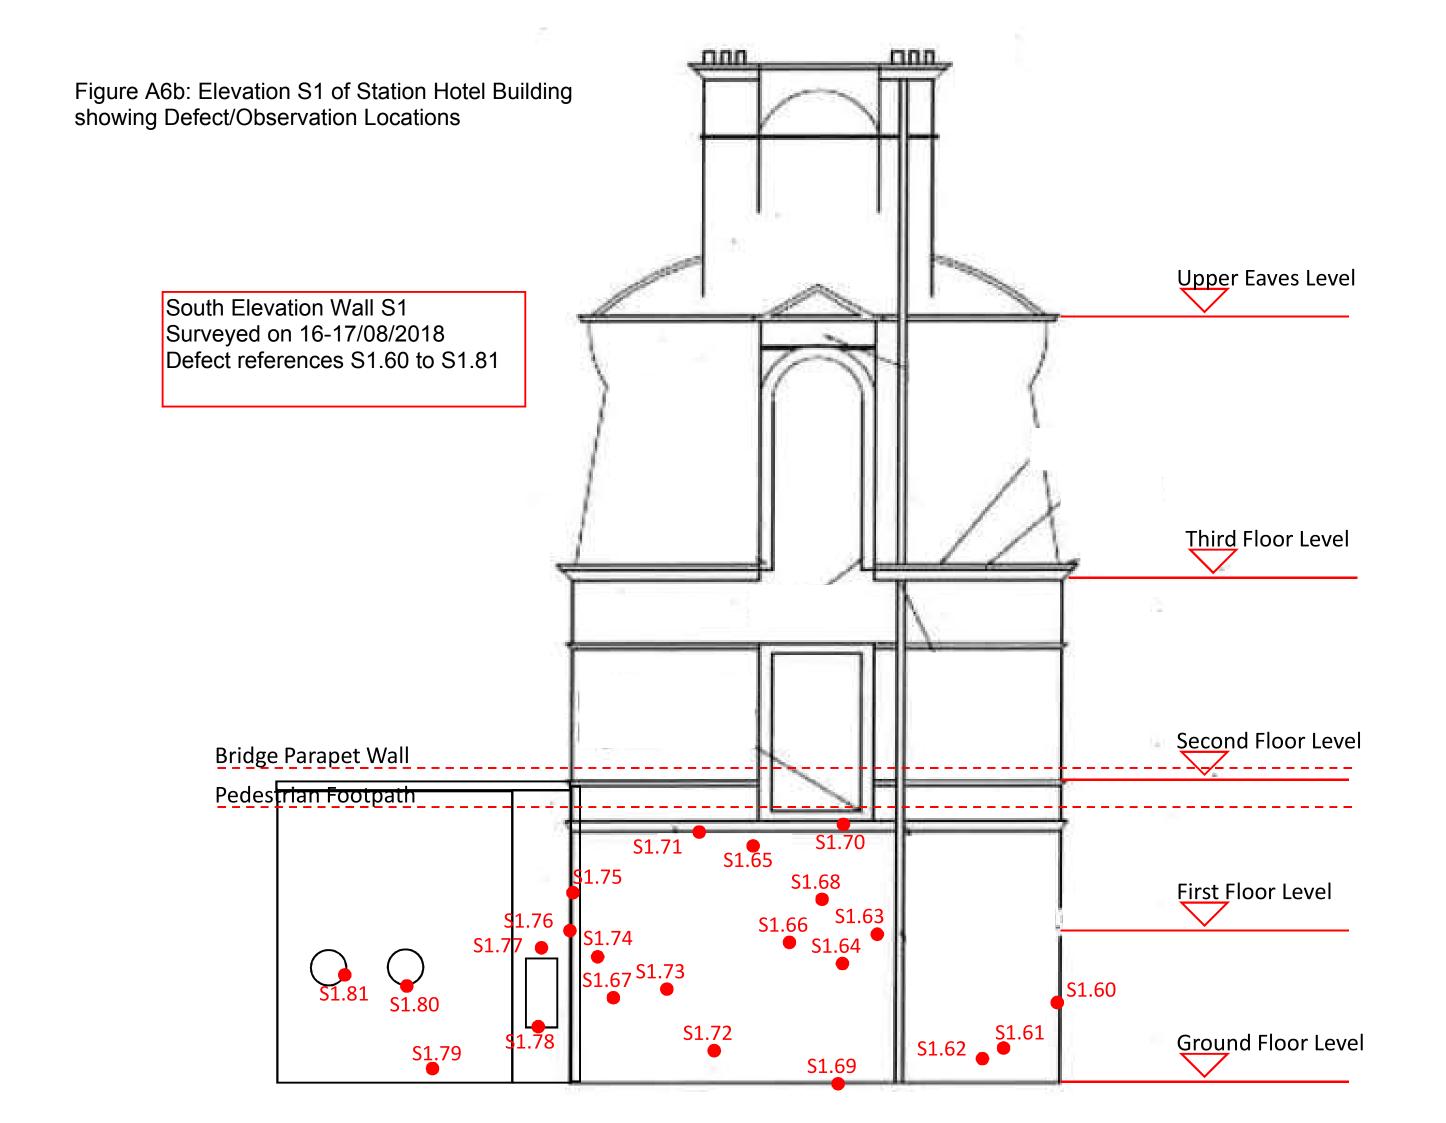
Elevation S1 of Station Hotel Building showing Defect/Observation Locations
